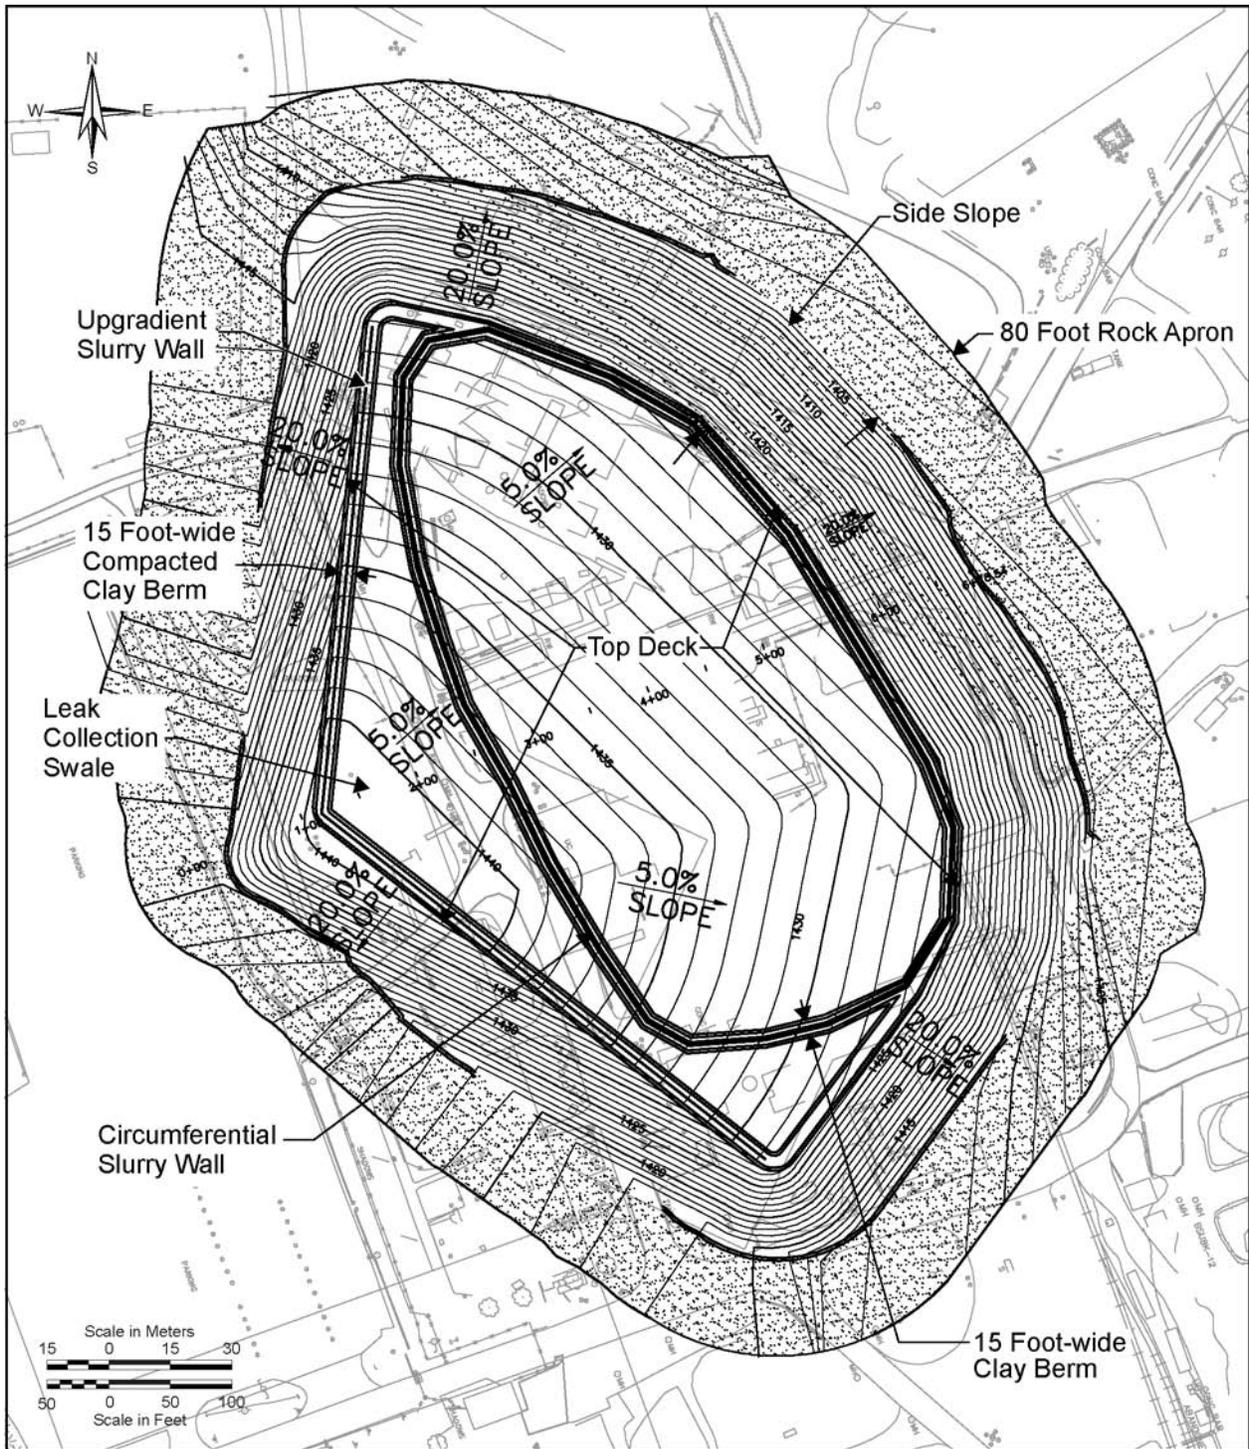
North Plateau Closure Cap Conceptual Plan View
